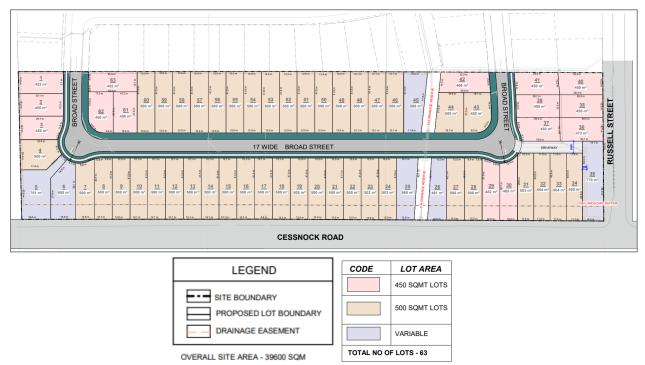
Proposed Subdivision Plan (Prepared by the Bathla Group)
